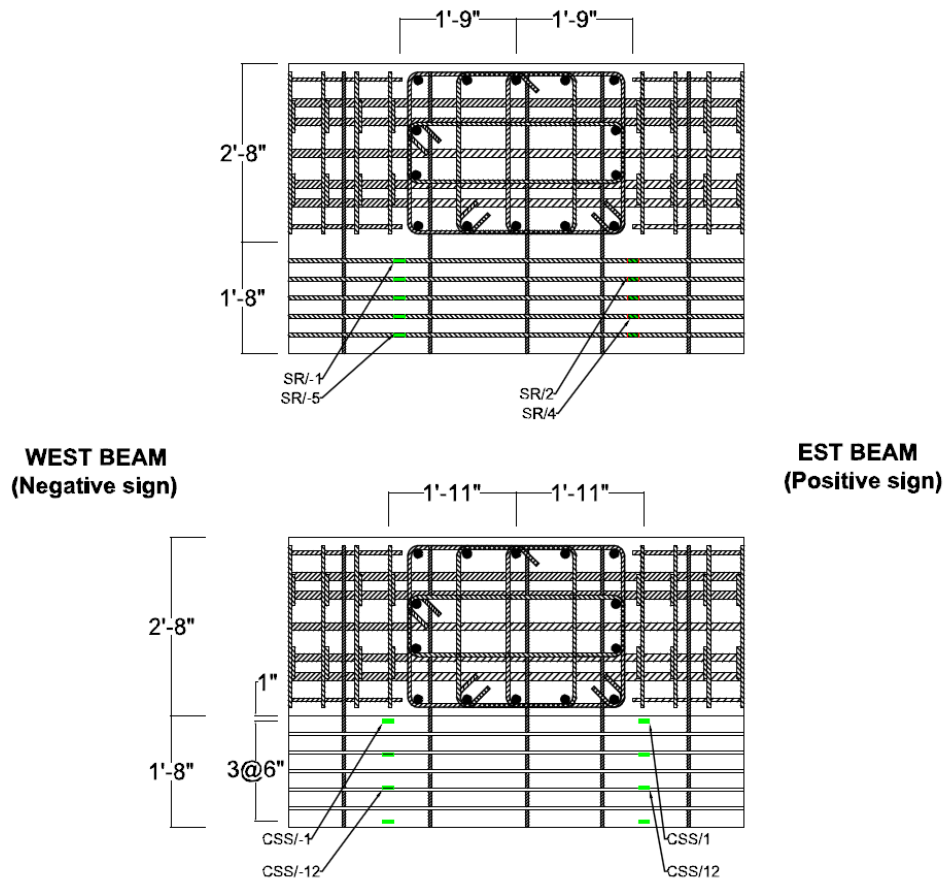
Locations of strain gauges on slab longitudinal reinforcement
